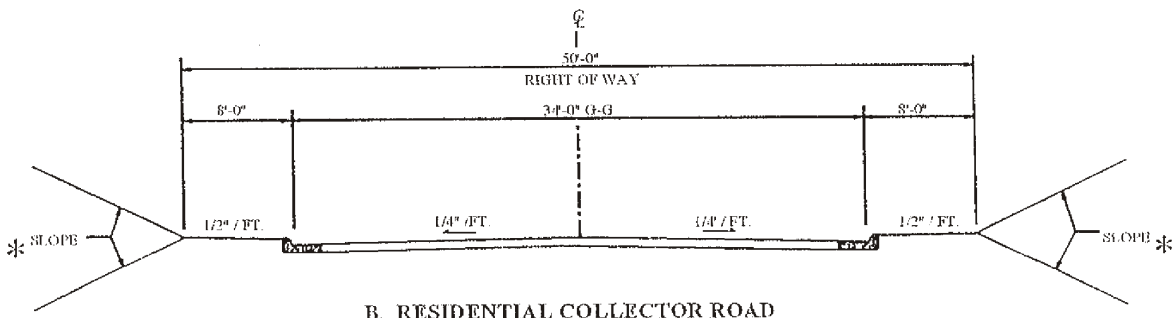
CROSS-SECTION-SHOULDER SECTION
